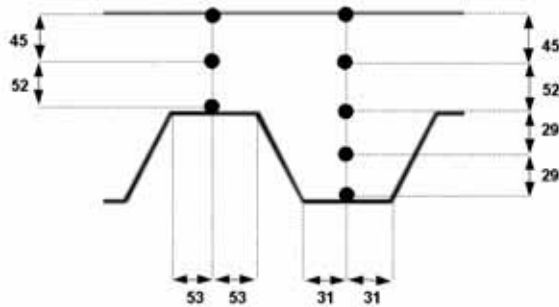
Typical cross section through composite slab showing thermocouple locations
